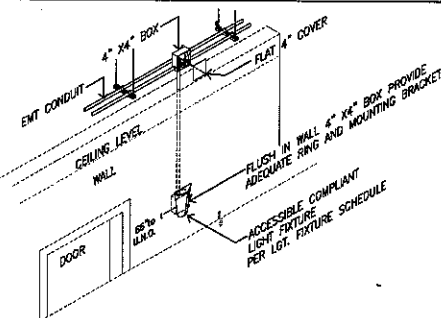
FLUSH DATA WALL BOX INST. N.T.S.
